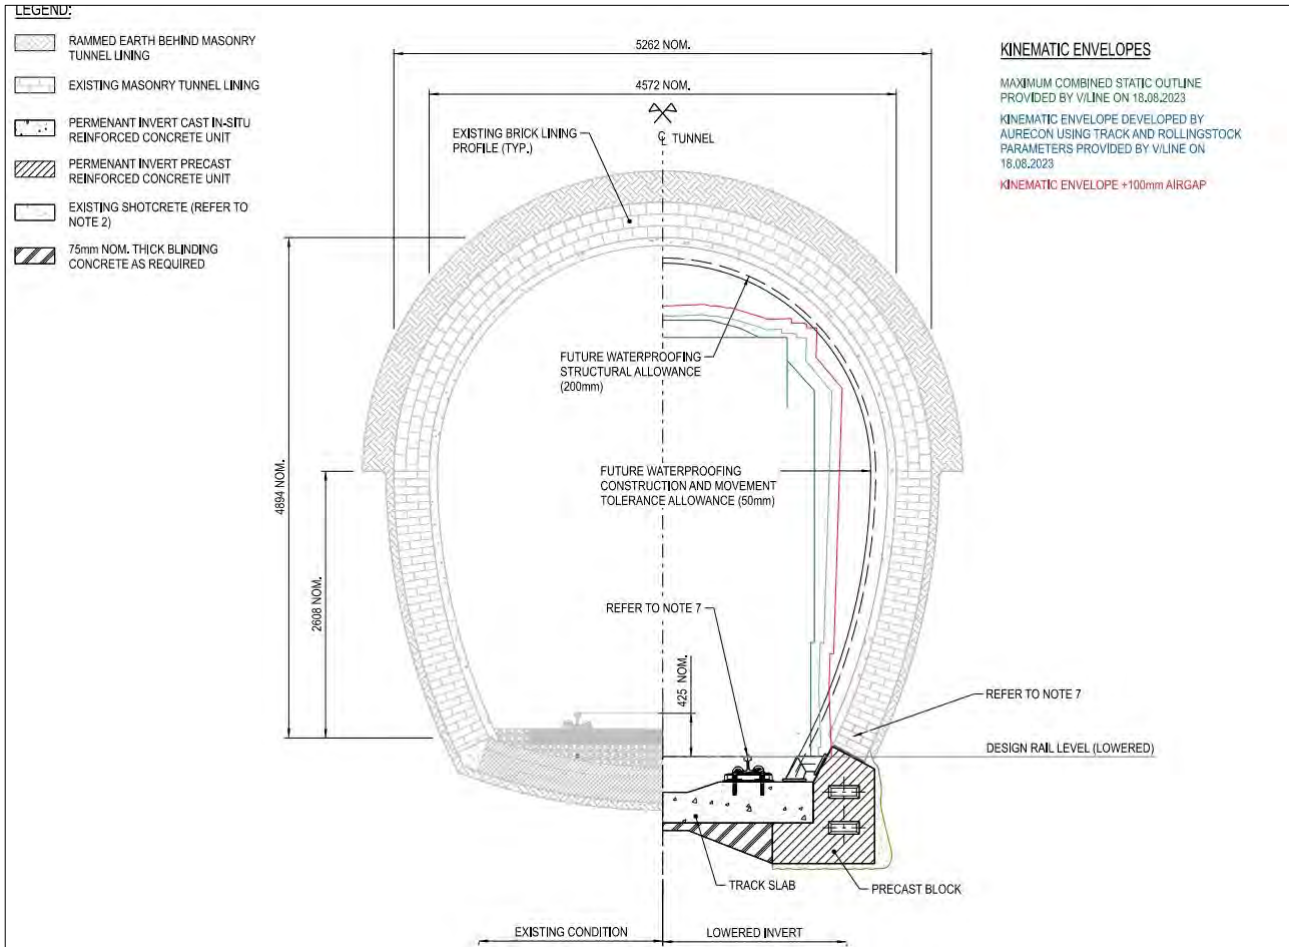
TYPICAL CROSS SECTION SHOWING EXISTING PROFILE (LHS) AND PROPOSED MINIMUM INTERNAL PROFILE REQUIREMENTS (RHS). (SOURCE: AURECON/VLINE)
